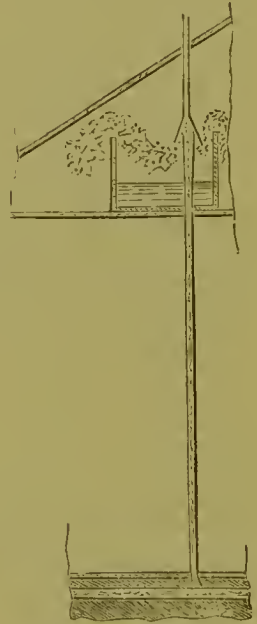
Same arrangement with Cistern partly empty, and Sewer-air escaping into House.
